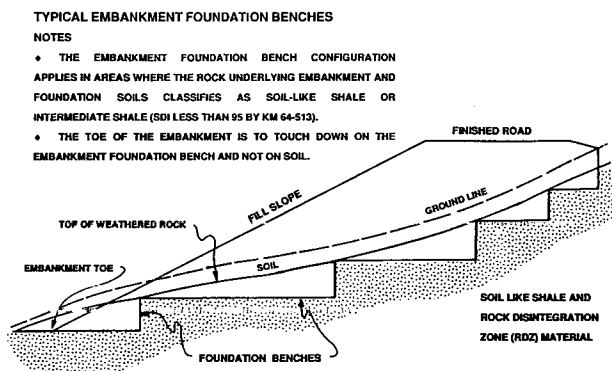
Typical Configuration Showing Benching Scheme for Sidehill Embankment Locations.
